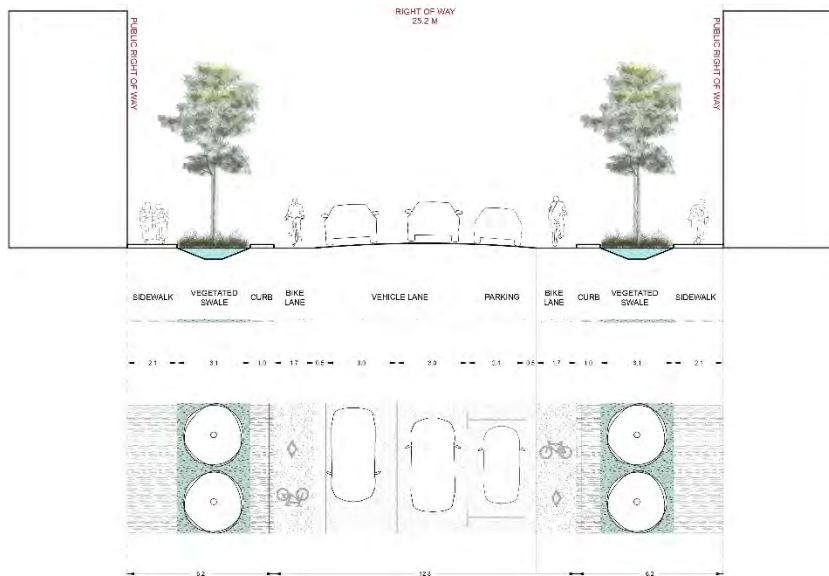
Optimized Downtown Complete Street Cross-Section
